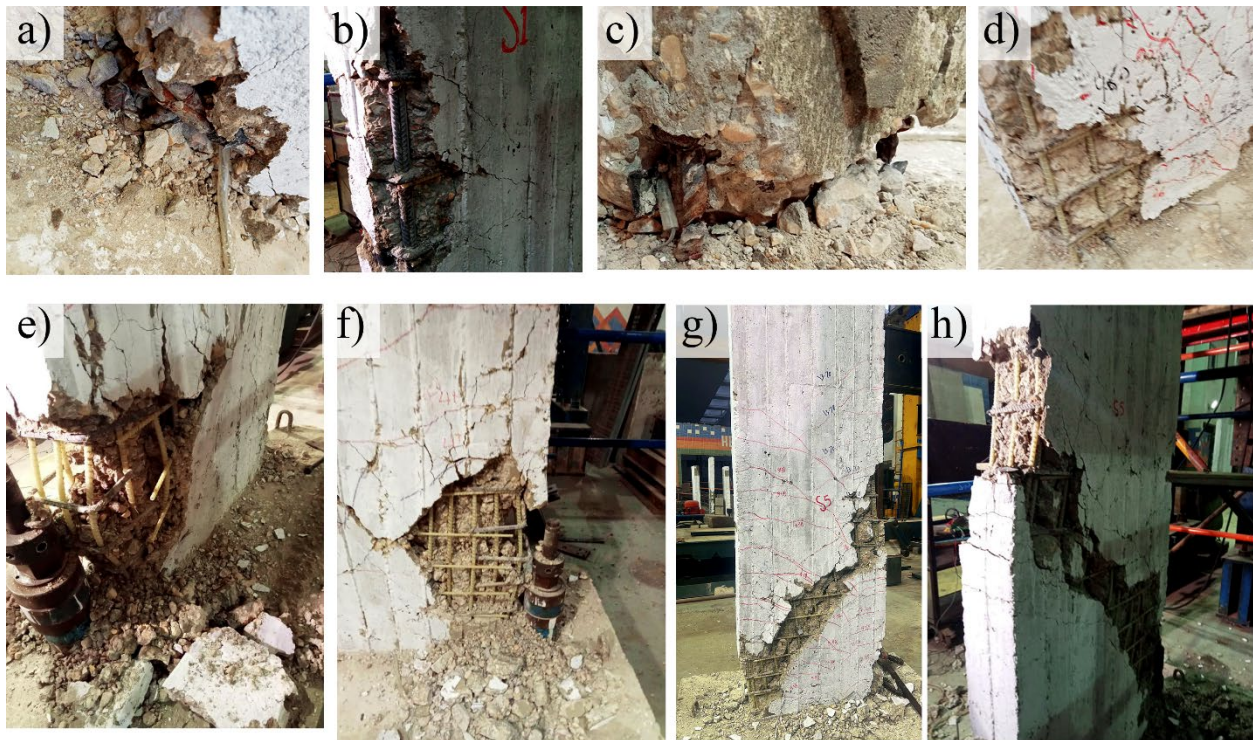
Damage observed at failure of walls a) SW1, b) SGW1, c) SGW2, d) GW1, e-f) GW2, and g-h) GW3
